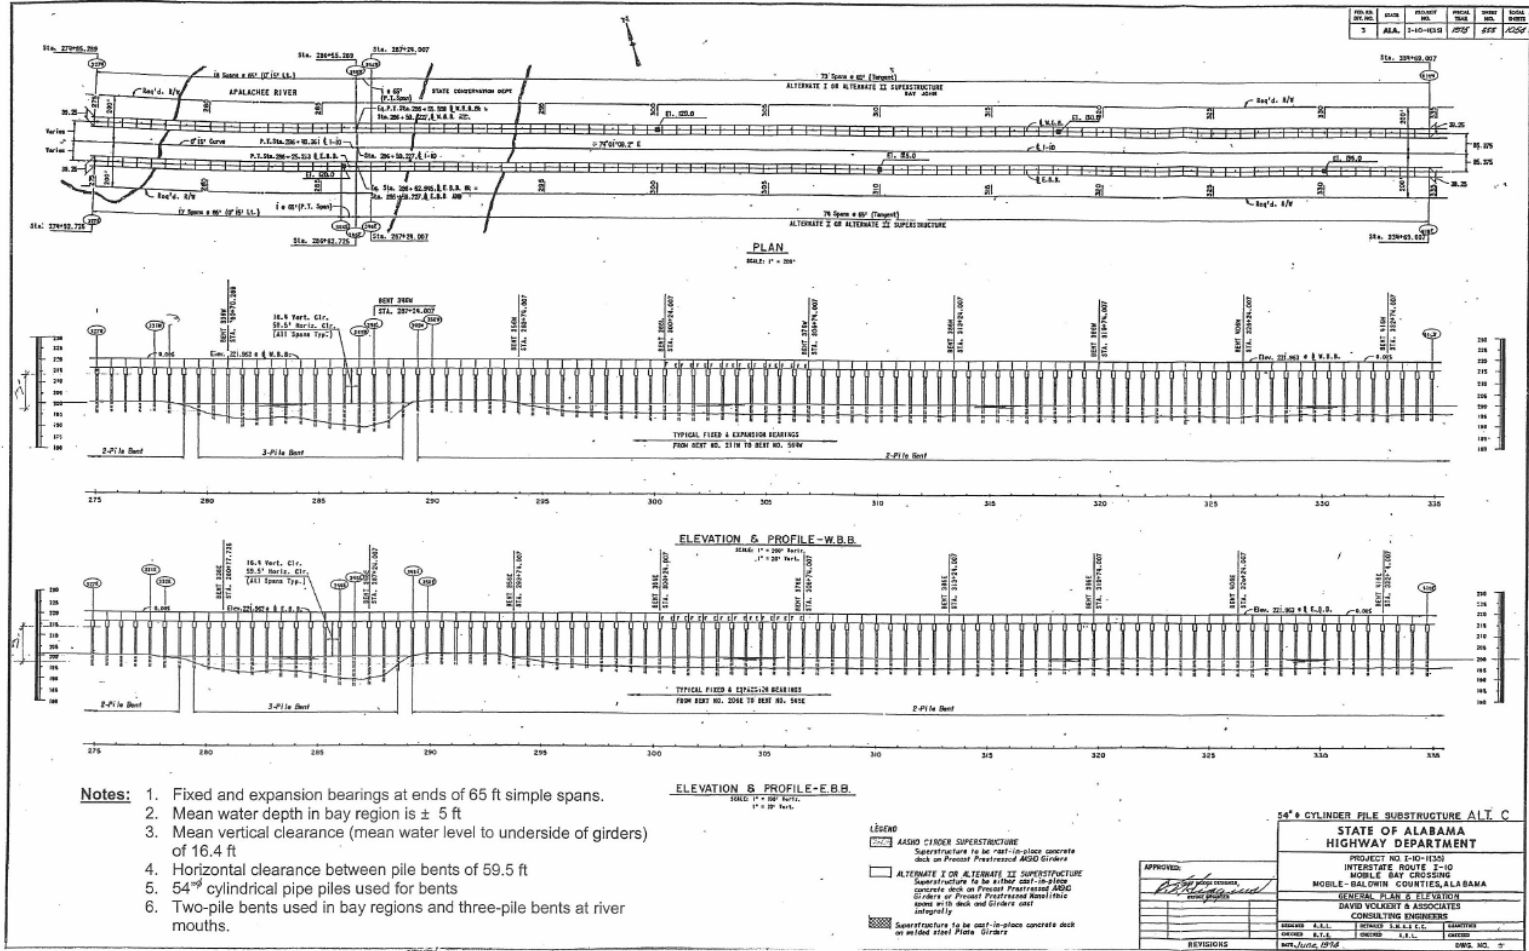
Plan and Elevation/Profile of I-10 Bridge Across Mobile Bay
